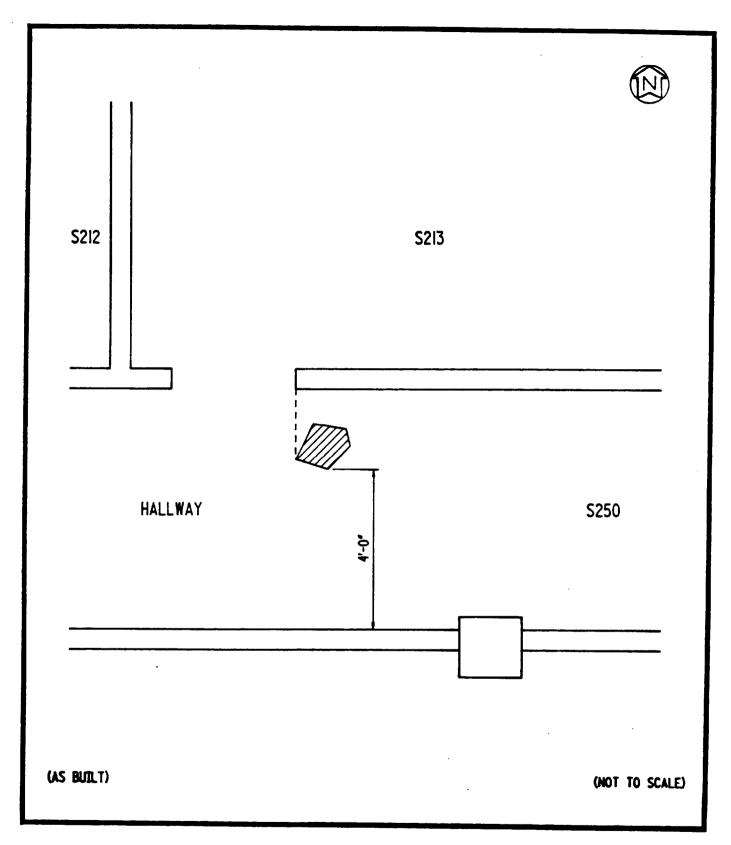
HALLWAY OUTSIDE ROOM S213—AREA WHERE REMEDIAL ACTION WAS PERFORMED ON THE FLOOR
